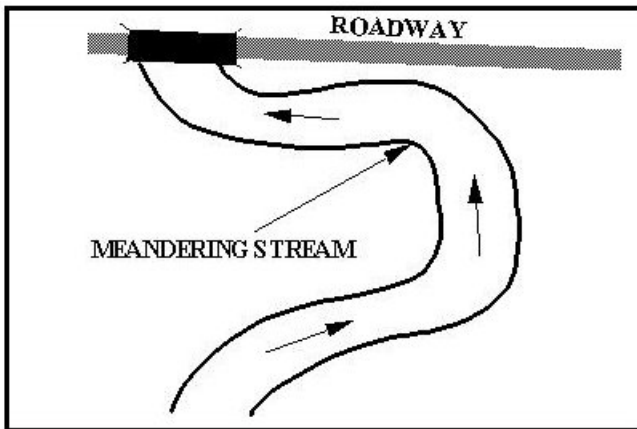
Meandering Stream Threatening Bridge and Approach Roadway
